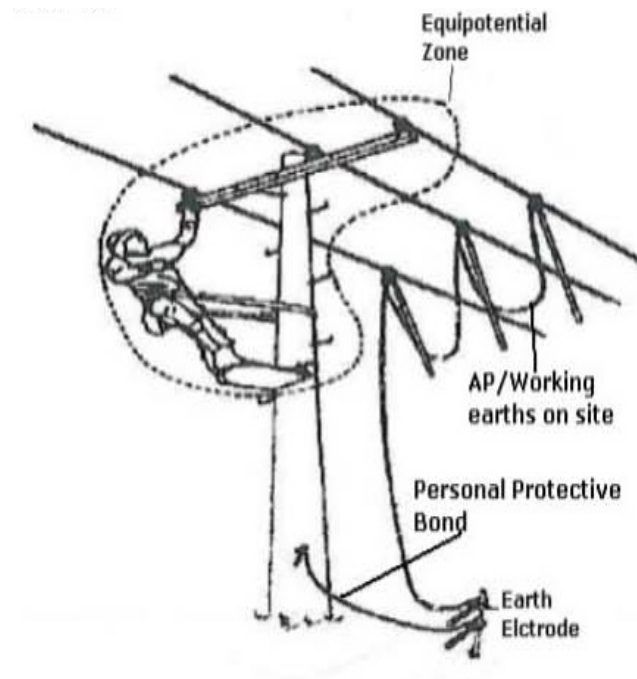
Personal Protective Bond installed with Access Permit/ working earths on steel or concrete structure. Source: EE2377
